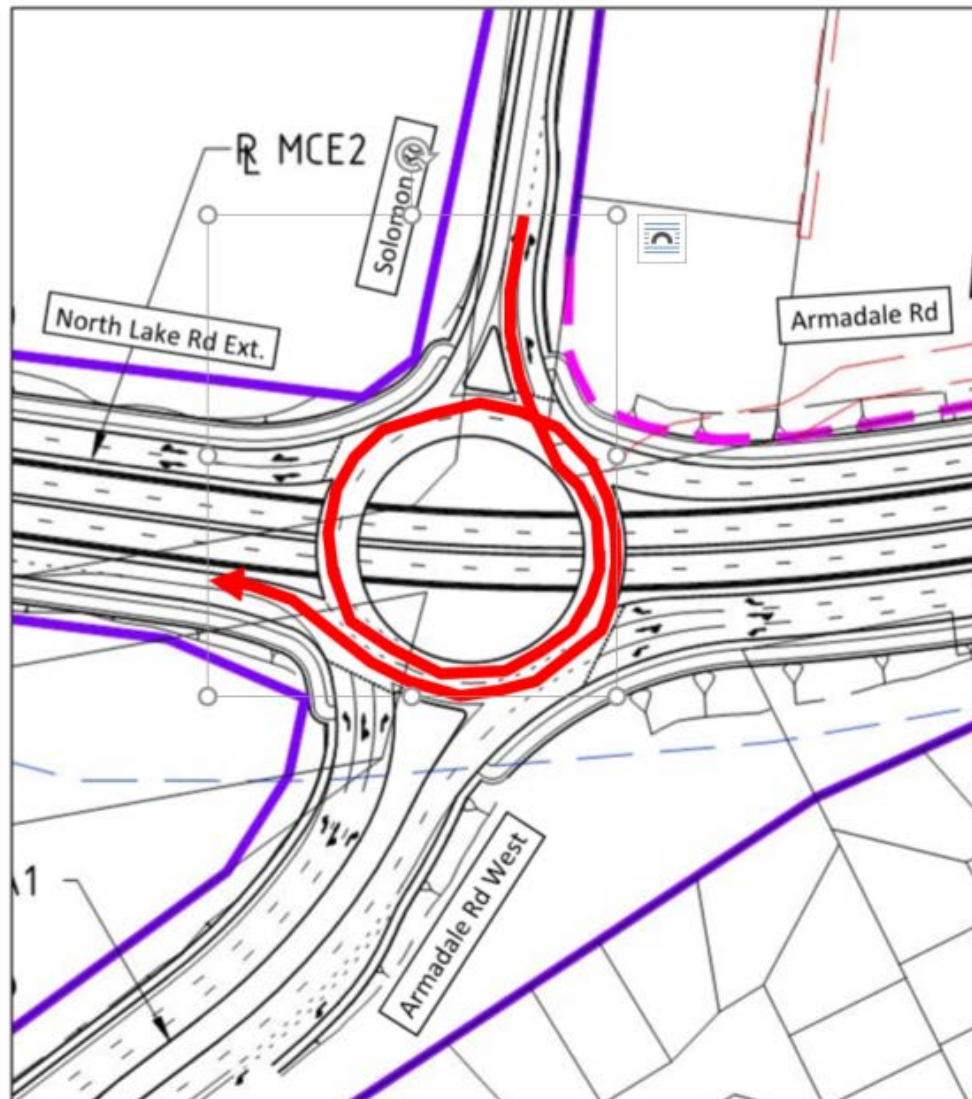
North Lake Road/Armadale Road/Solomon Road Intersection Layout
